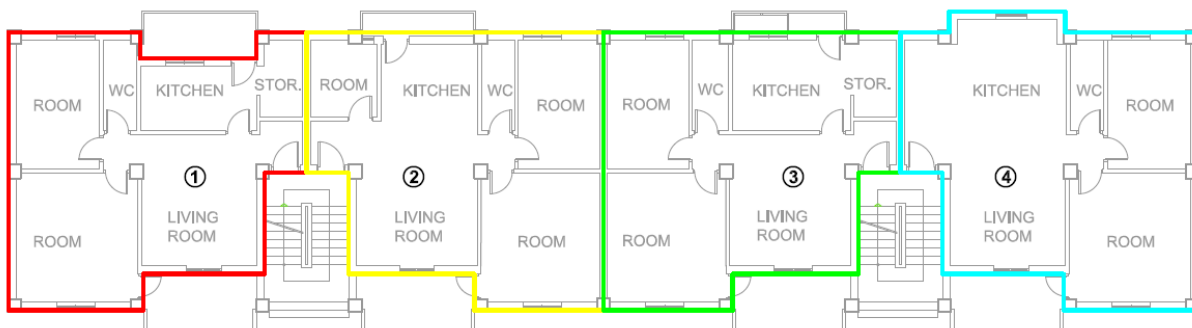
The initial floor plan of a typical apartment (No 1) and the most commonly found interventions (No 2,3,4) integrated in a floor plan.
